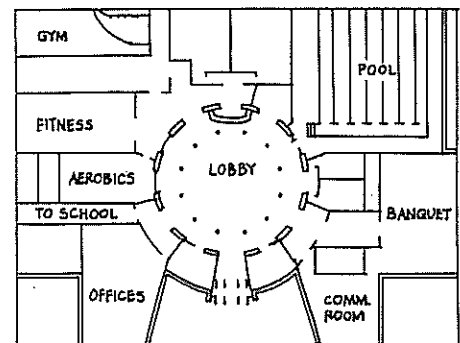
Floor Plan detail of Lobby and surrounding spaces
